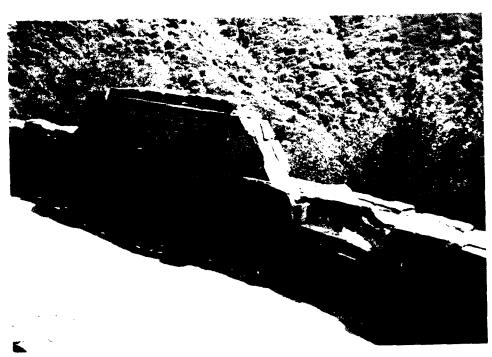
Parapet wall on downslope side of highway just above Granite Spring (4.7 Miles below Giant Forest Market)
